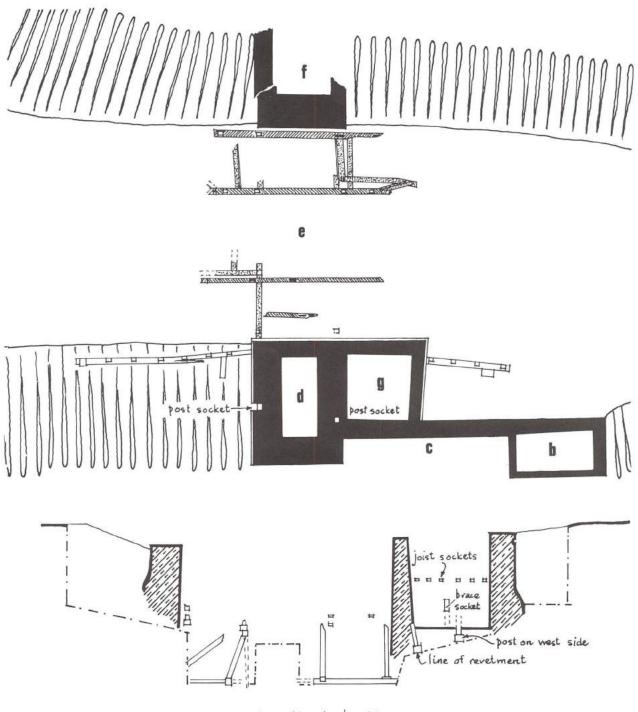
Southchurch Hall. Plan showing buildings and excavations.
